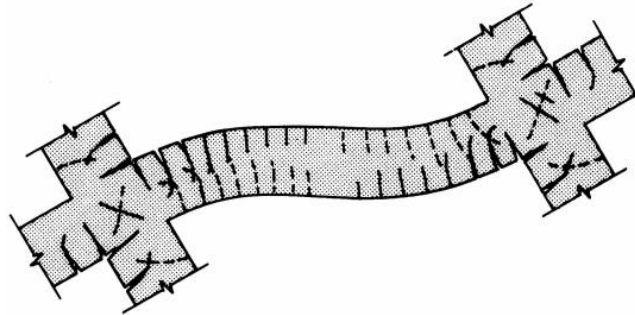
Deformation of reinforced concrete beam under gravity and earthquake loads (Otani 1980)
